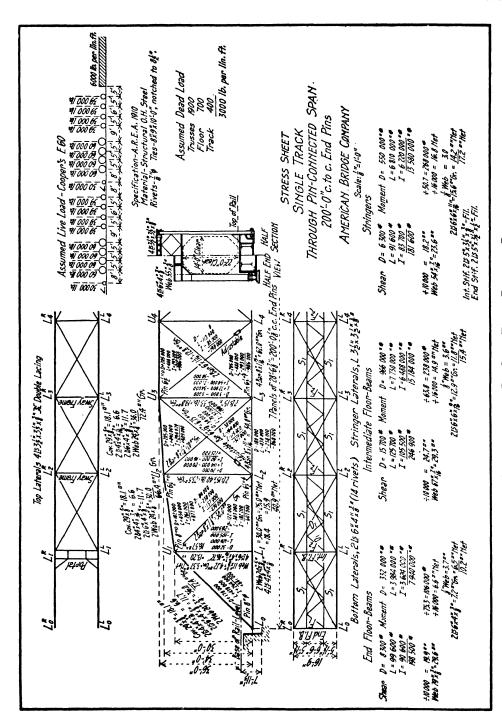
DESIGN FOR 200 FT. SPAN TRUSS RAILWAY BRIDGE.
